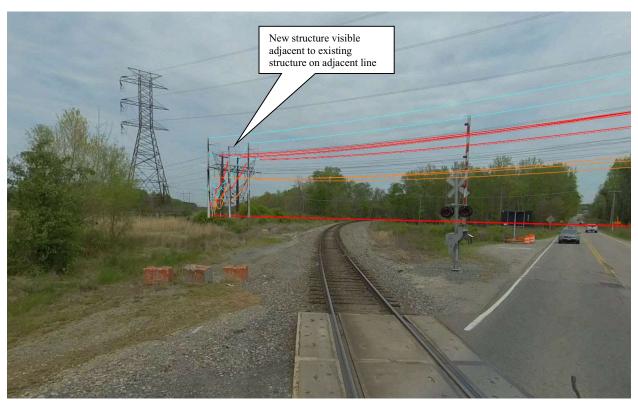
Rendering 1 - model of proposed structures and transmission line from Meadowbridge Road at railroad crossing (new 3-pole structure visible). Source: Google Streetview
